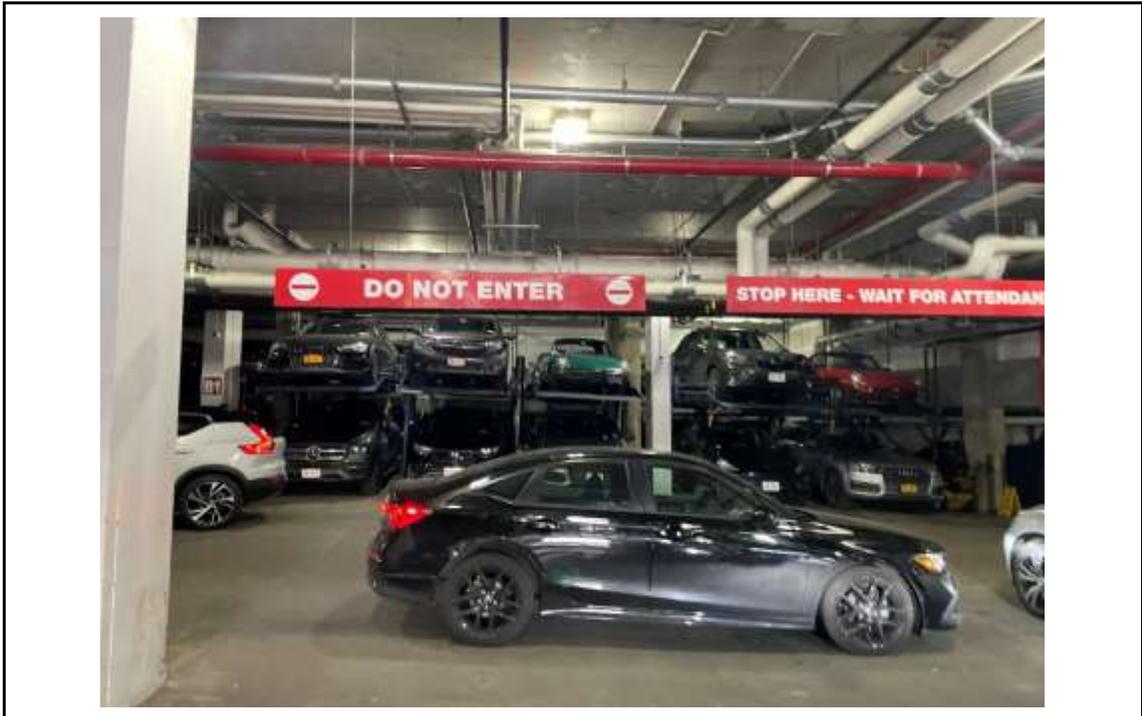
Subgrade parking garage entrance on 2nd Street, facing north. 02 March 2023.
